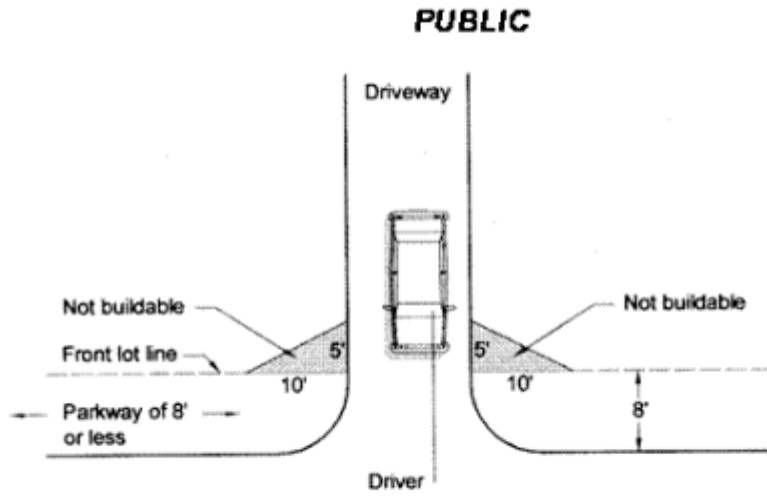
Visibility at Driveways on Public and Private Streets
